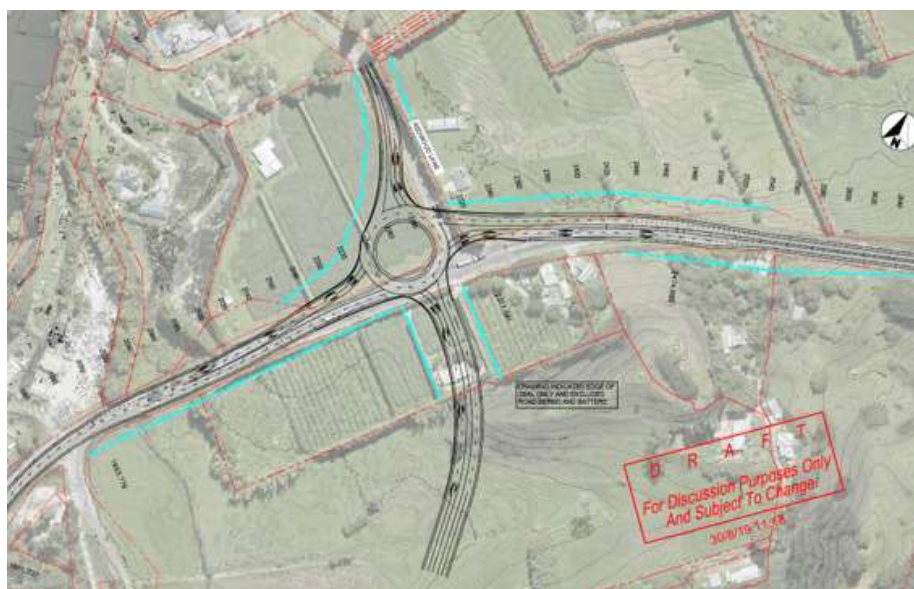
Option 2: Belk Road/Redwood Lane/SH29 Roundabout
